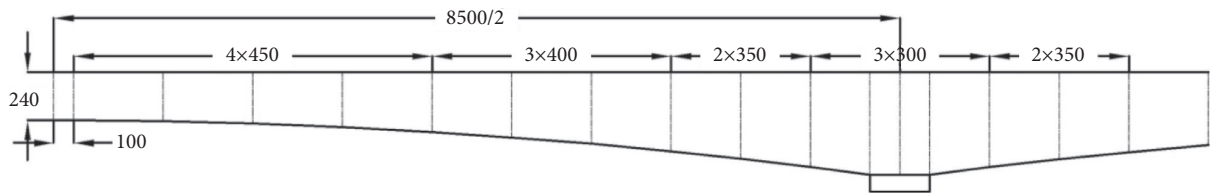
Elevation view of the middle span girder (dimension units: cm).
